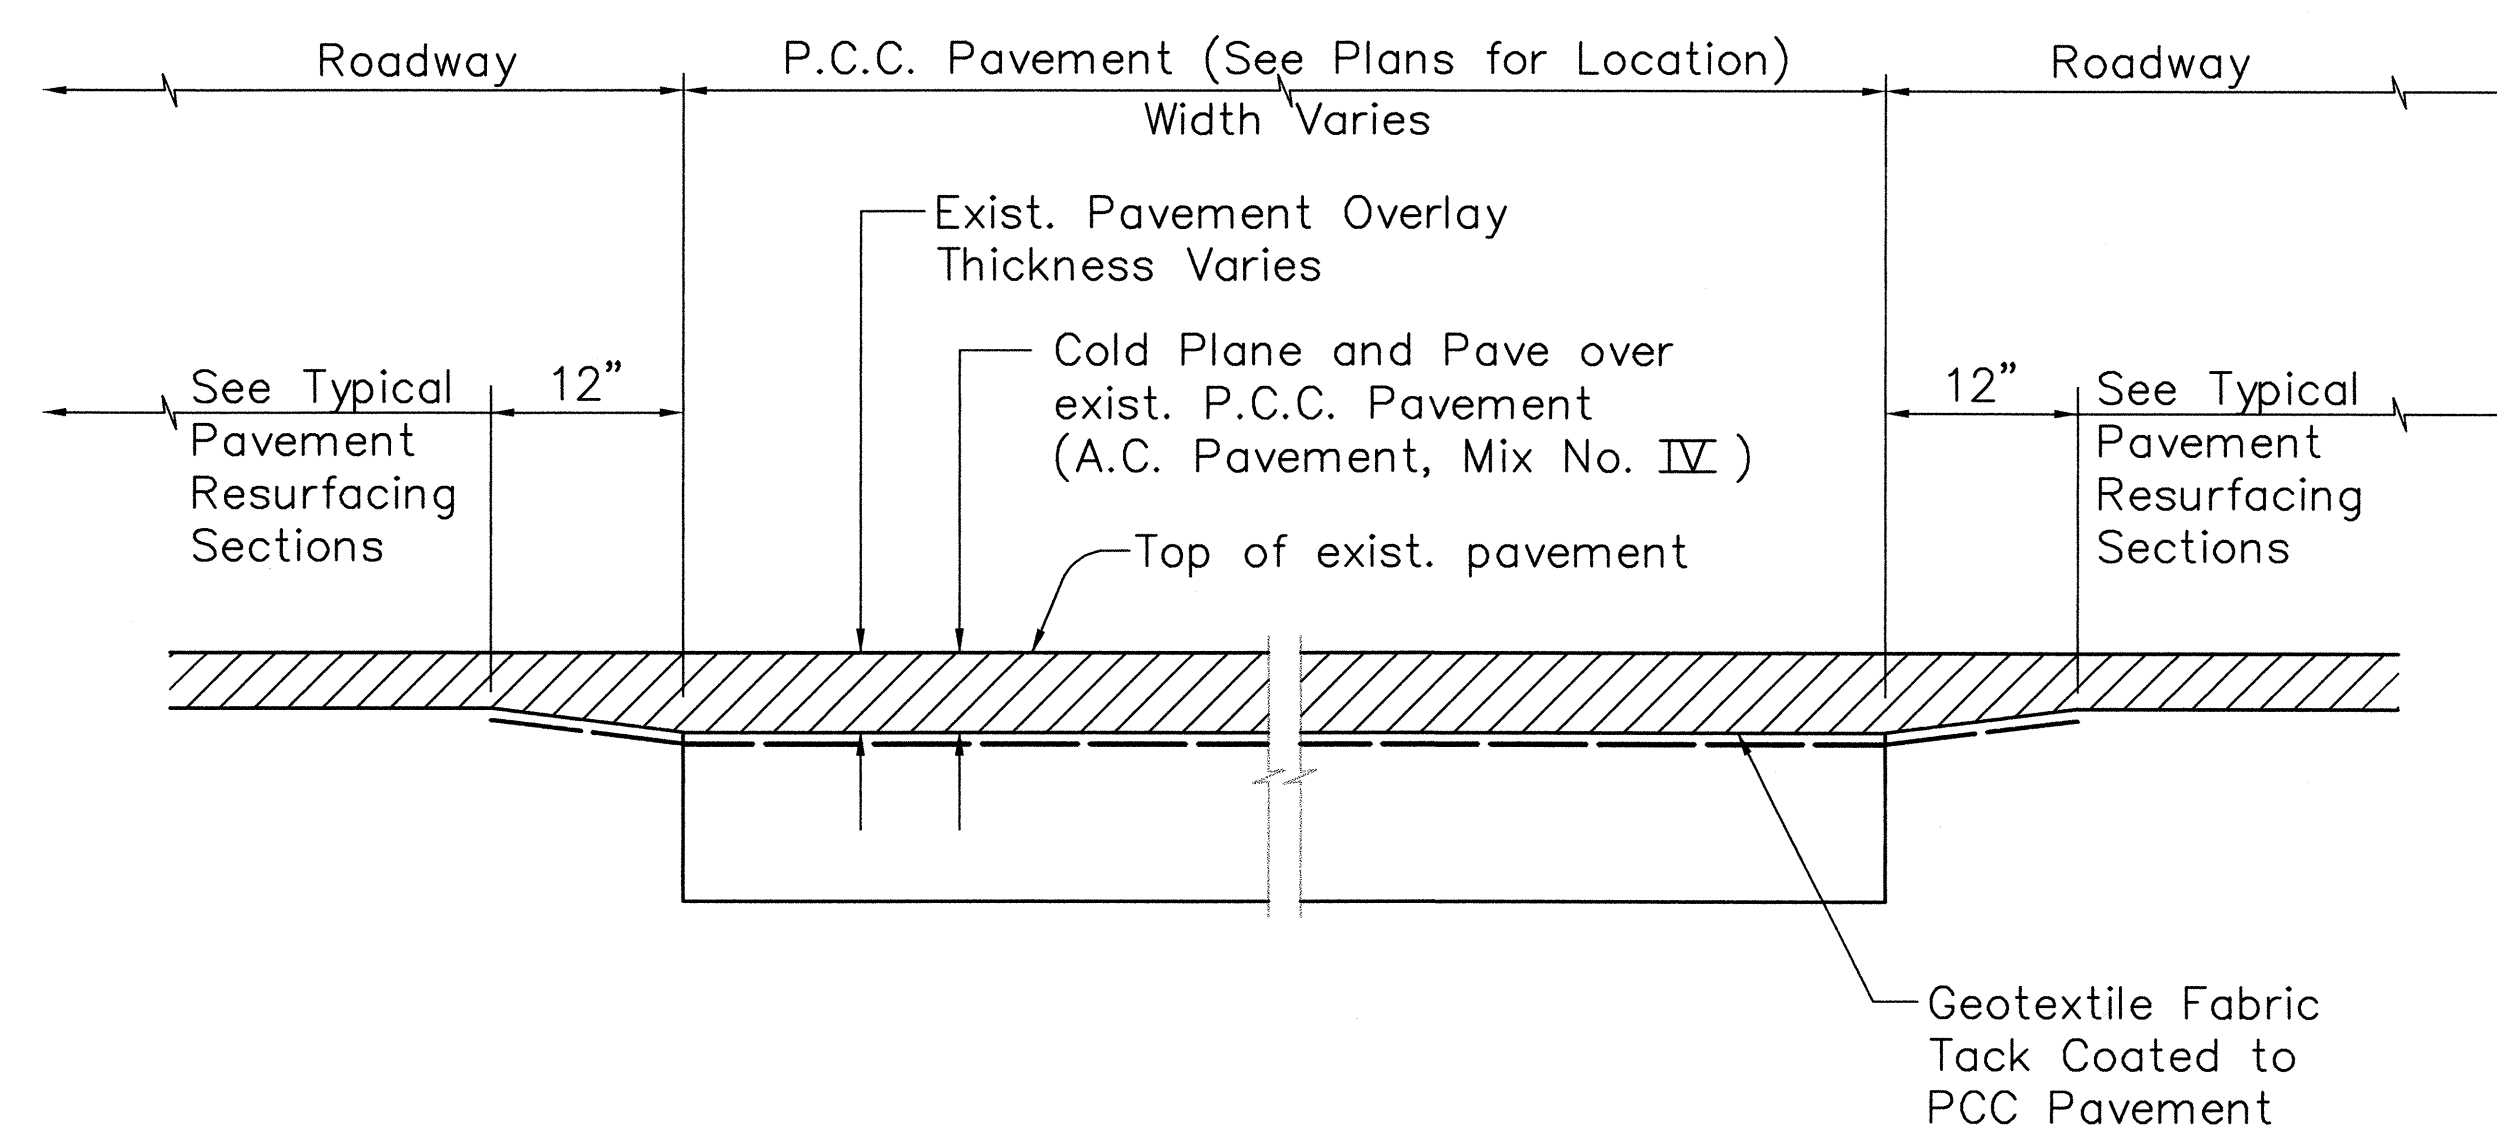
DETAIL OF COLD PLANING AND BRIDGE APPROACH RECONSTRUCTION AT EXISTING STRUCTURE
